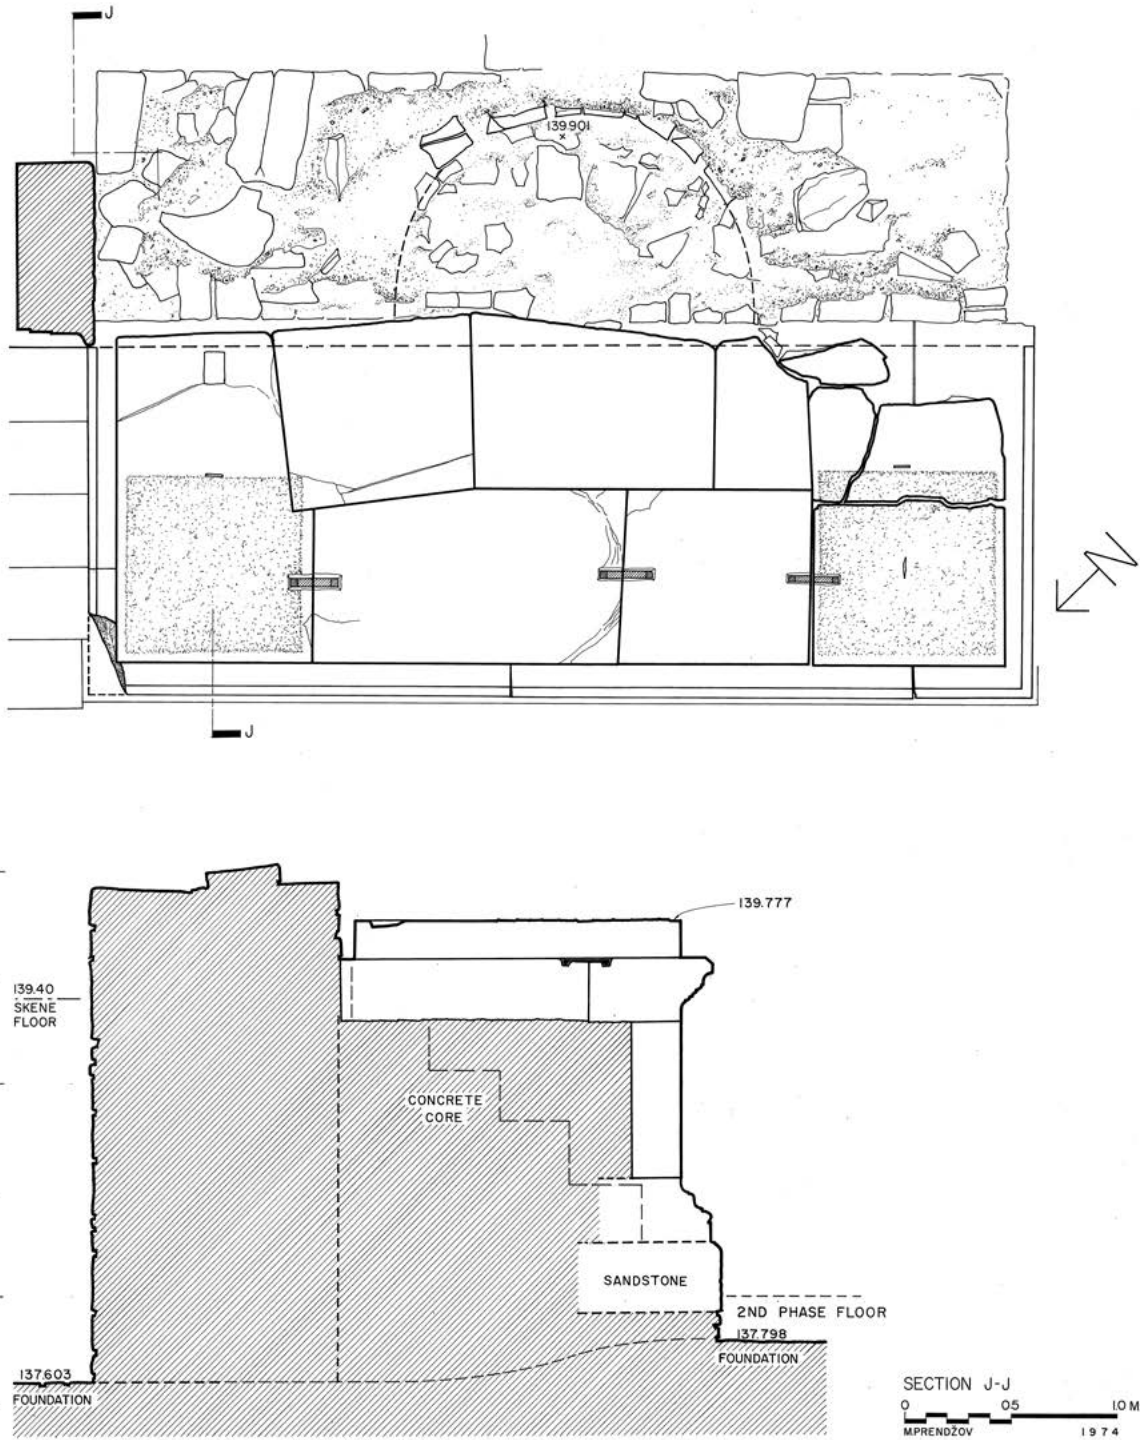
Section J-J, West Porch I, section and plan (M. Prendzov 1974).
